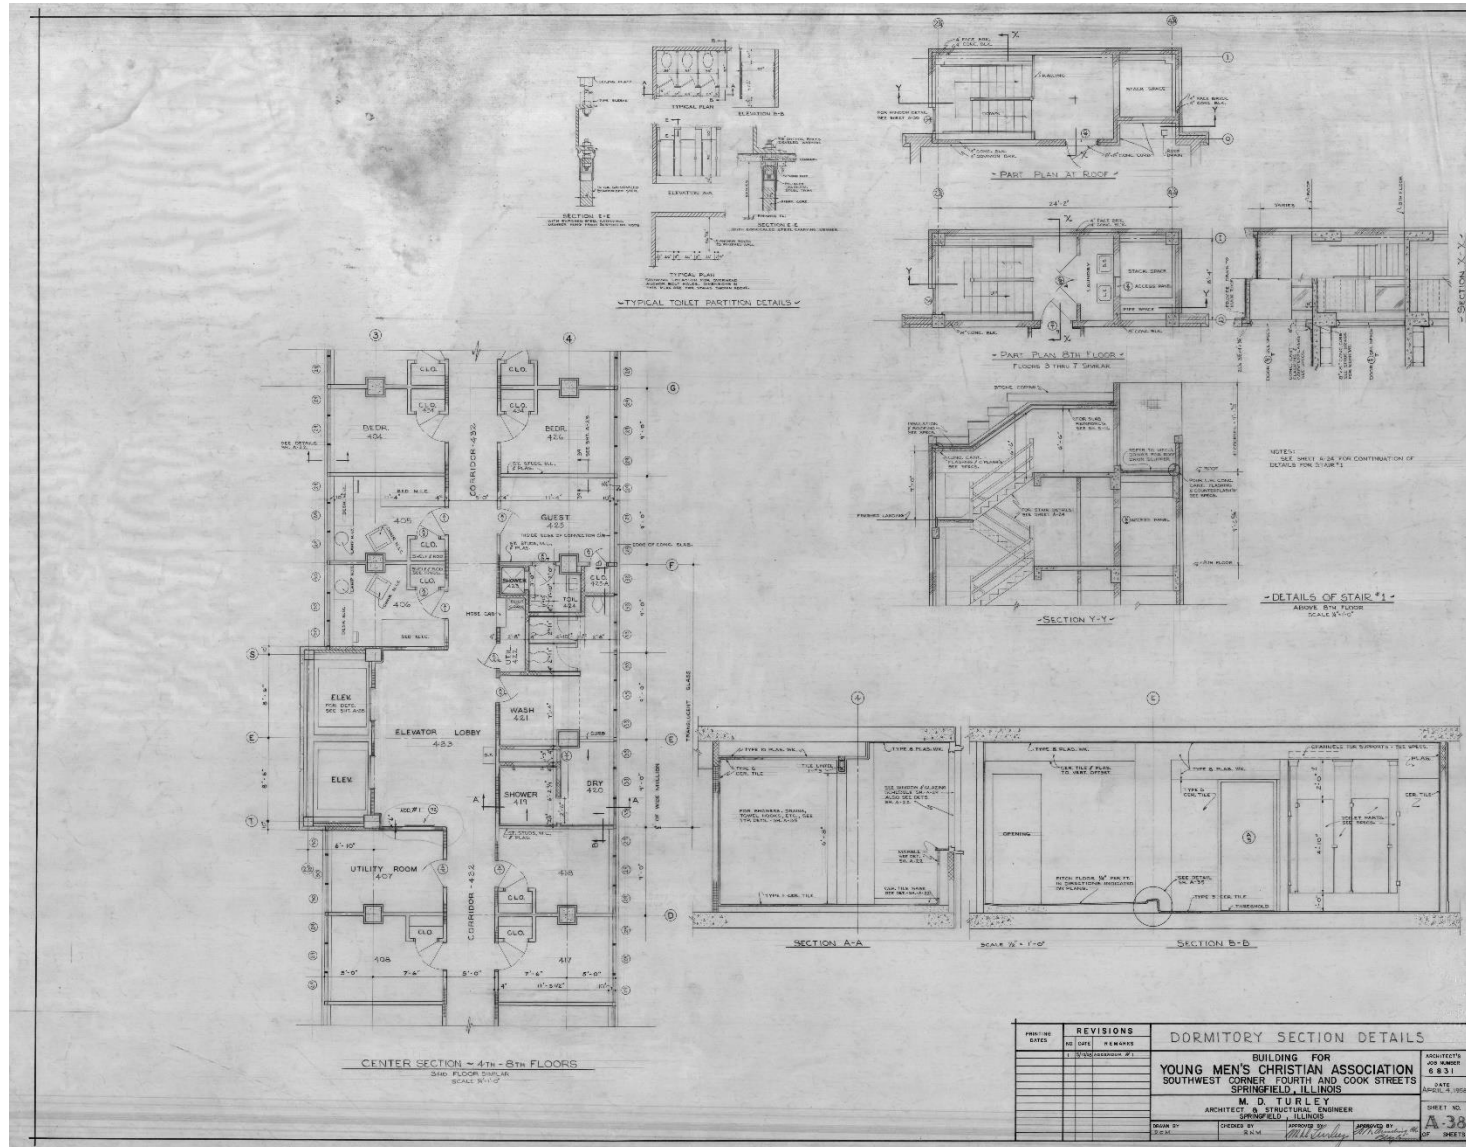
Dormitory Section Details (Turley 1958; Sheet No. A-38).
